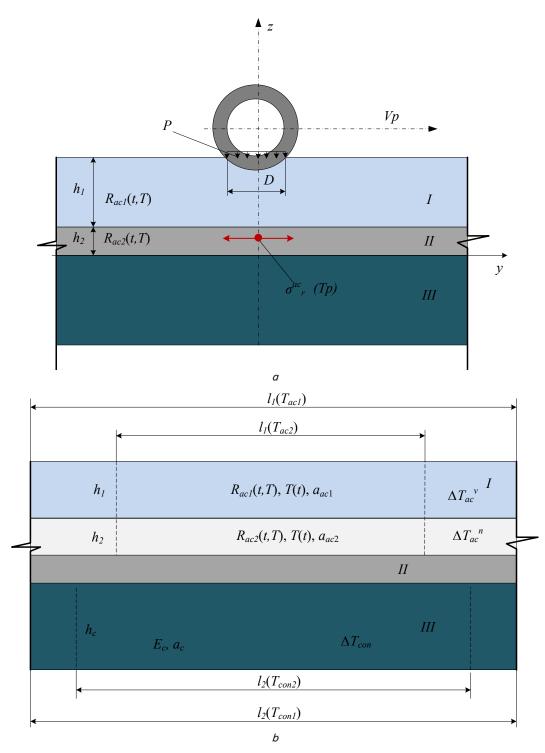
Estimation scheme of asphalt concrete pavement (I) with adhesion of asphalt concrete layers, connected to the base of reinforced concrete (III) through waterproofing material (BIGUMA-ICP Gusstex) (II): under the action of: a – vehicles; b – temperature
